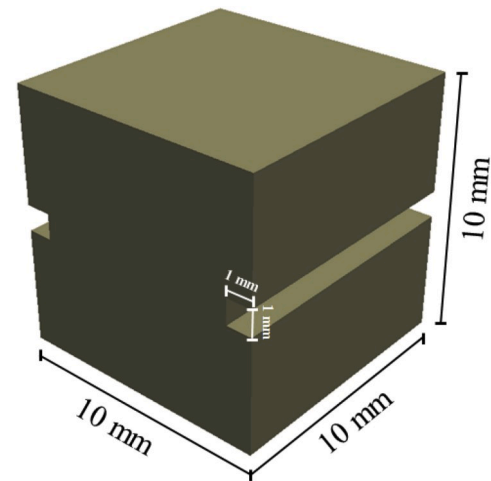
Dimensions of the prepared mortar specimen for the uniaxial tension test.
